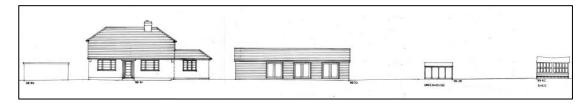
Existing Cherry Tree Lane Street Elevation with PD
